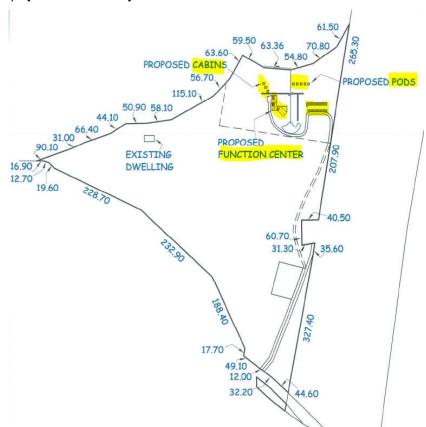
Site plan. Drawing source, Weeda Drafting, Project 16618
